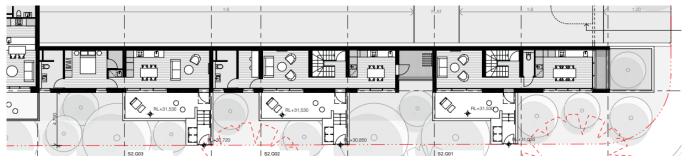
Building S2 - Ground Level Plan Showing Walker Street Terraces
